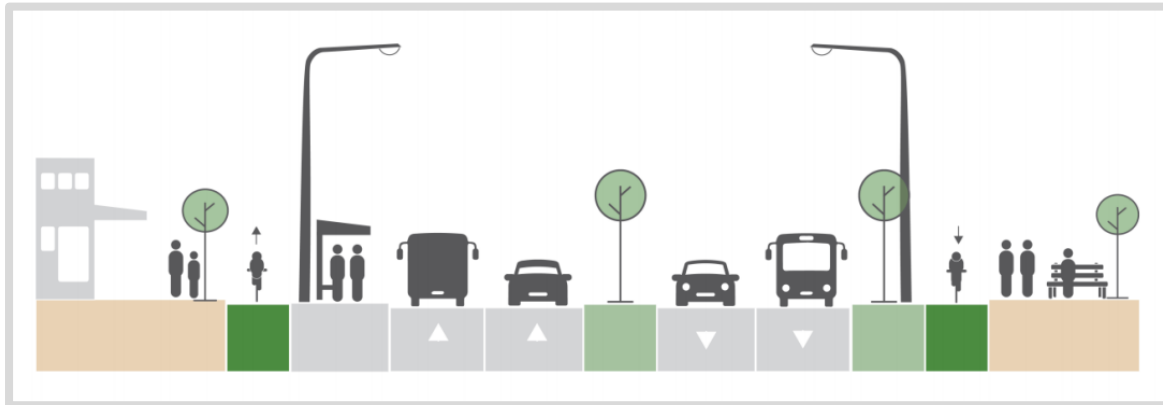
SGA ITA Urban Collector Road Indicative Cross Section (21m)
